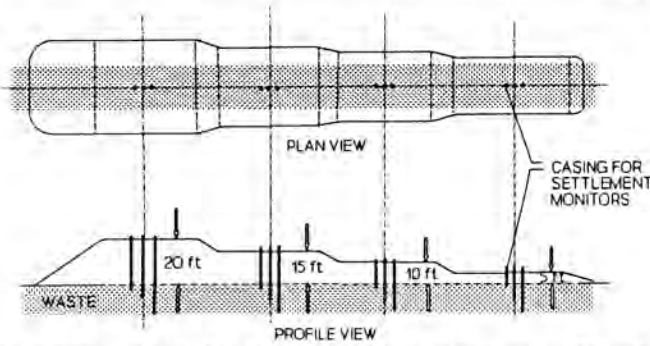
Plan and profile view of a static surcharge test fill and placement of settlement monitors (after McMullin, 1992a).
